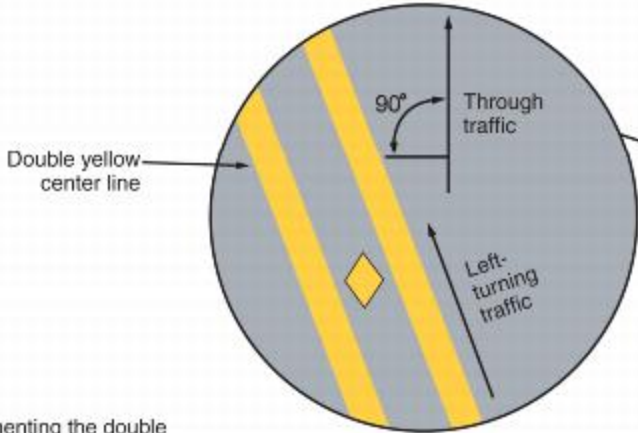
B-15H. Example of Raised Pavement Marker (RPM)
